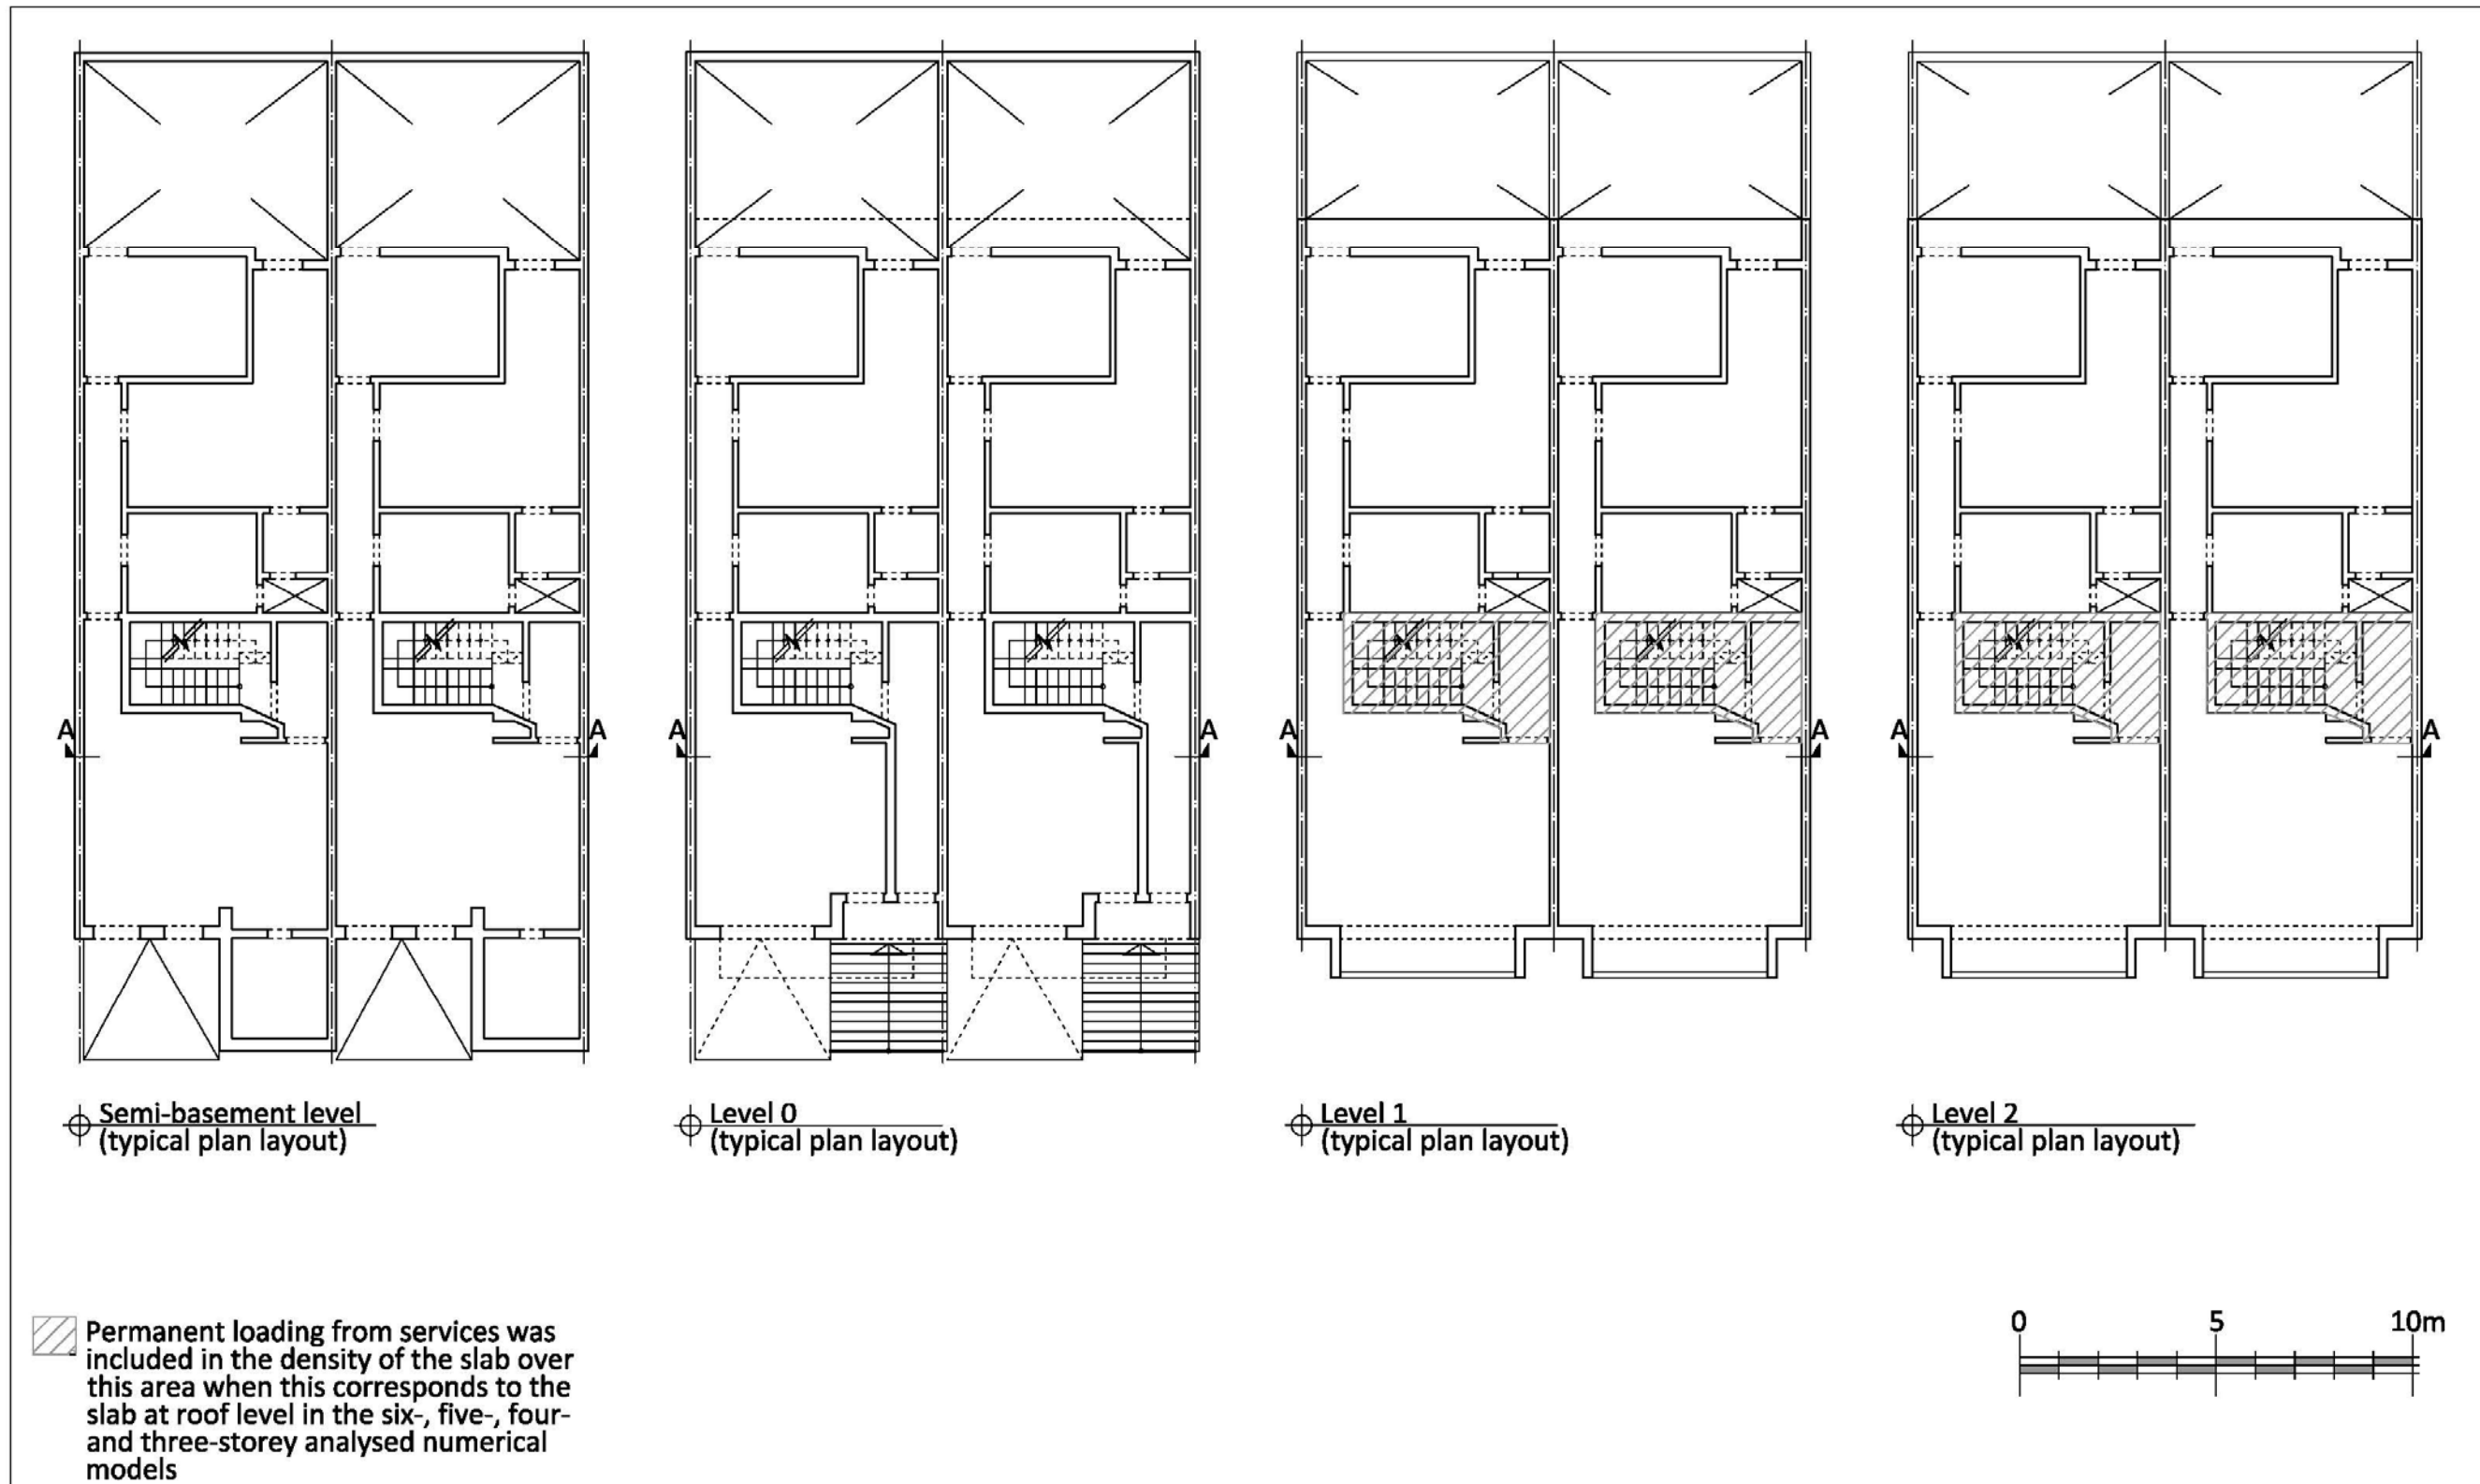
Plan layouts at semi-basement level and Levels 0 to 2 for analysed two-building control numerical models (plan length-to-width ratio 1.37:1).
